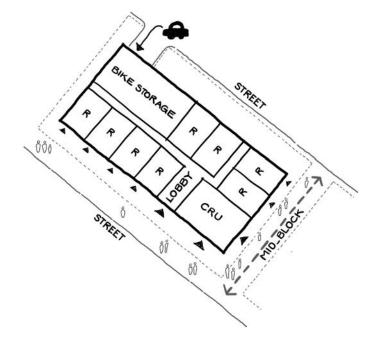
Active uses line the street and mid-block connection, while building services, vehicular, and loading access are provided from the lane or lowest-classified adjacent street.
